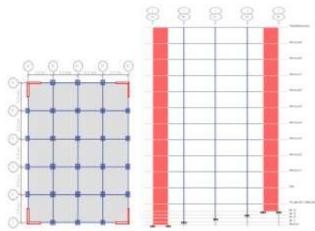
Plan & Elevation for model with slope angle of 45^o with Shear walls at corners.
